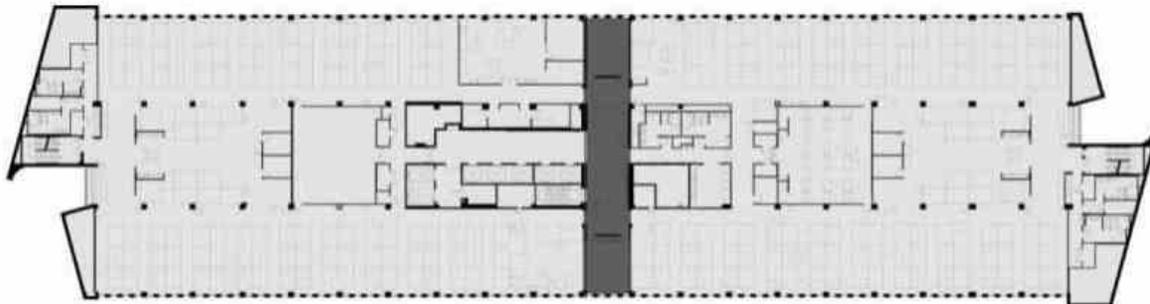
Federal Office Building, typical upper floor plan, ca. 2008
